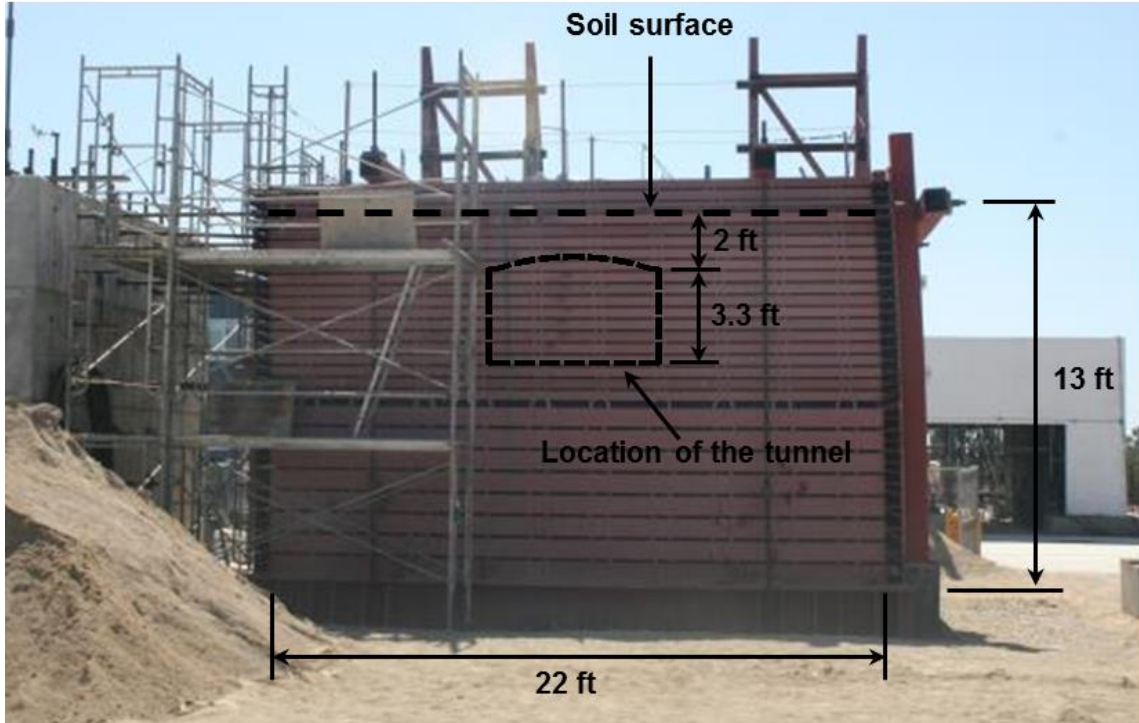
Photograph of UCSD laminar soil shear box under quasi-static loading
